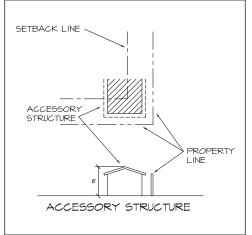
C3. ACCESSORY BUILDING ENVELOPE EXAMPLE
